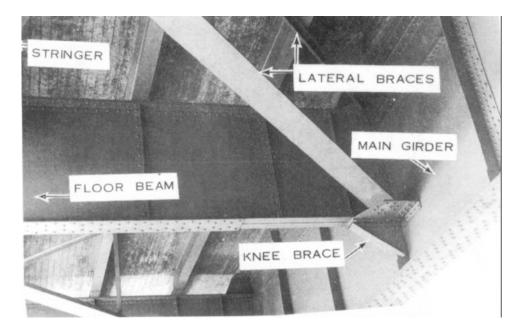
Typical floor systems. (Sheet 1 of 3)
